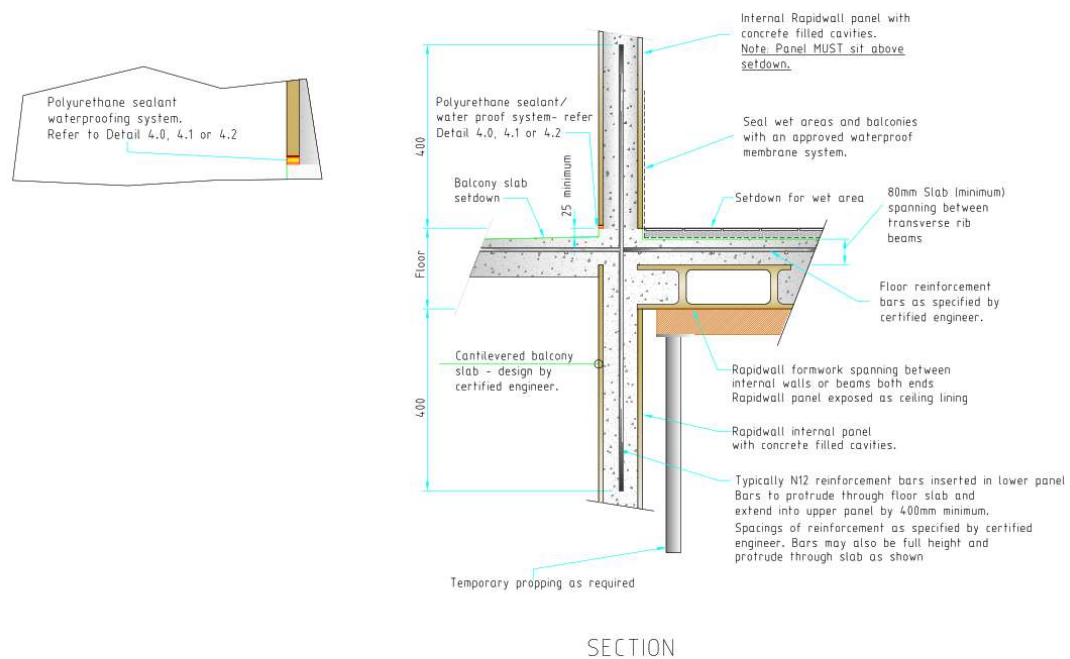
Concrete filled Rapidwall with Rapidwall slab formwork / ceiling balcony and set down details
